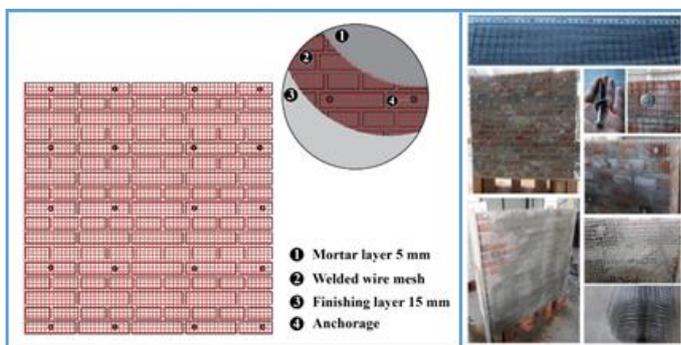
Plastering process with ferrocement jacketing (FC) (schematic view and application) (left) and repairing with ferrocement (right).
